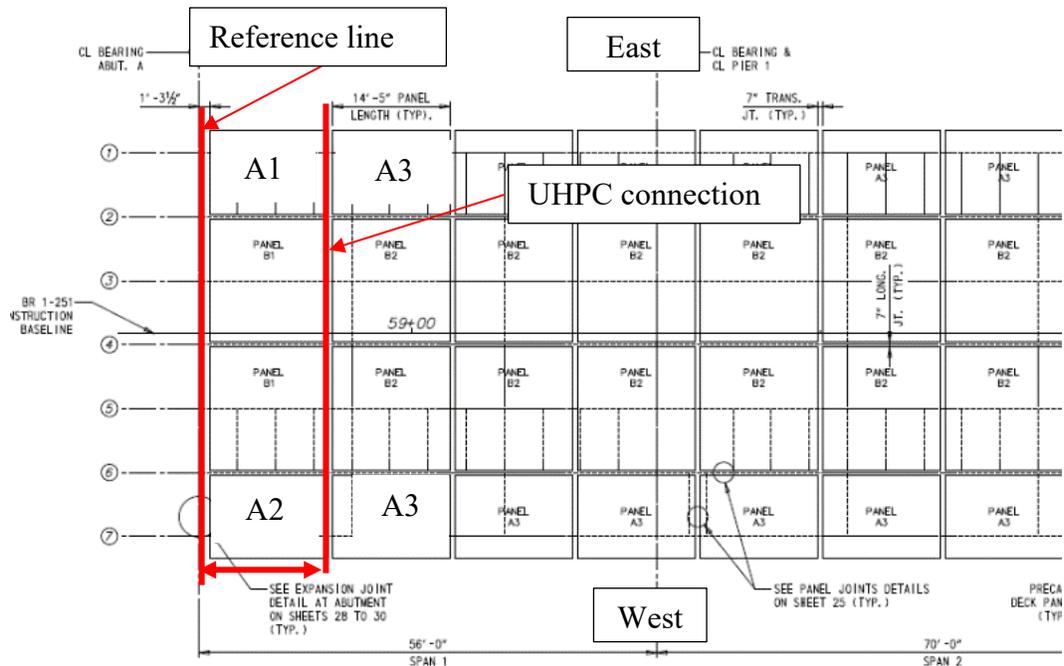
Plan view of the deck panel layout with the expansion joint as reference line.
